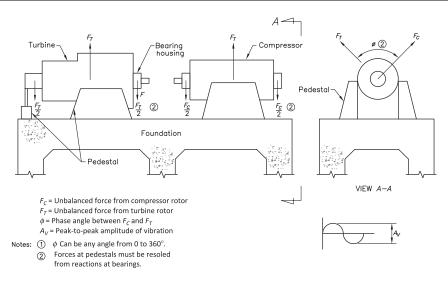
Unbalanced forces from turbine and compressor rotors.
